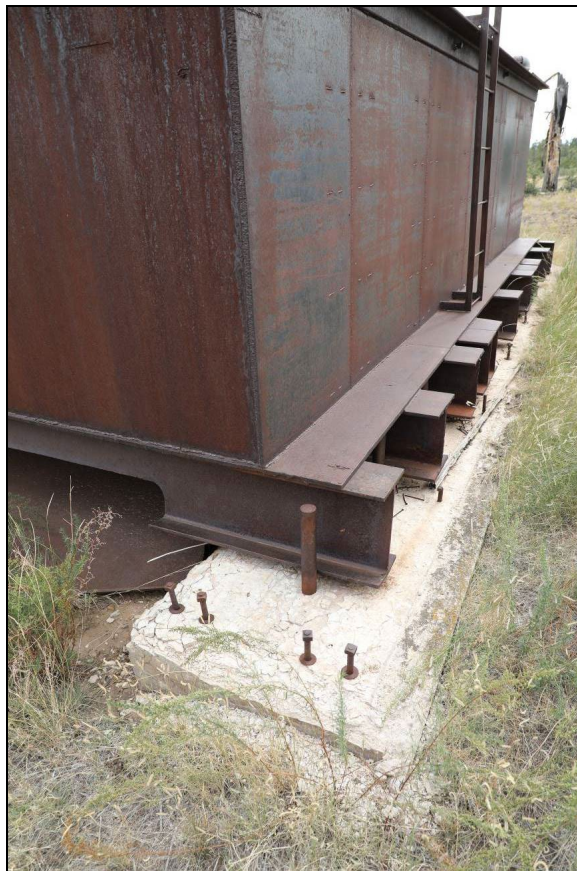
The concrete foundation is in poor condition - especially near the corners and edges.
